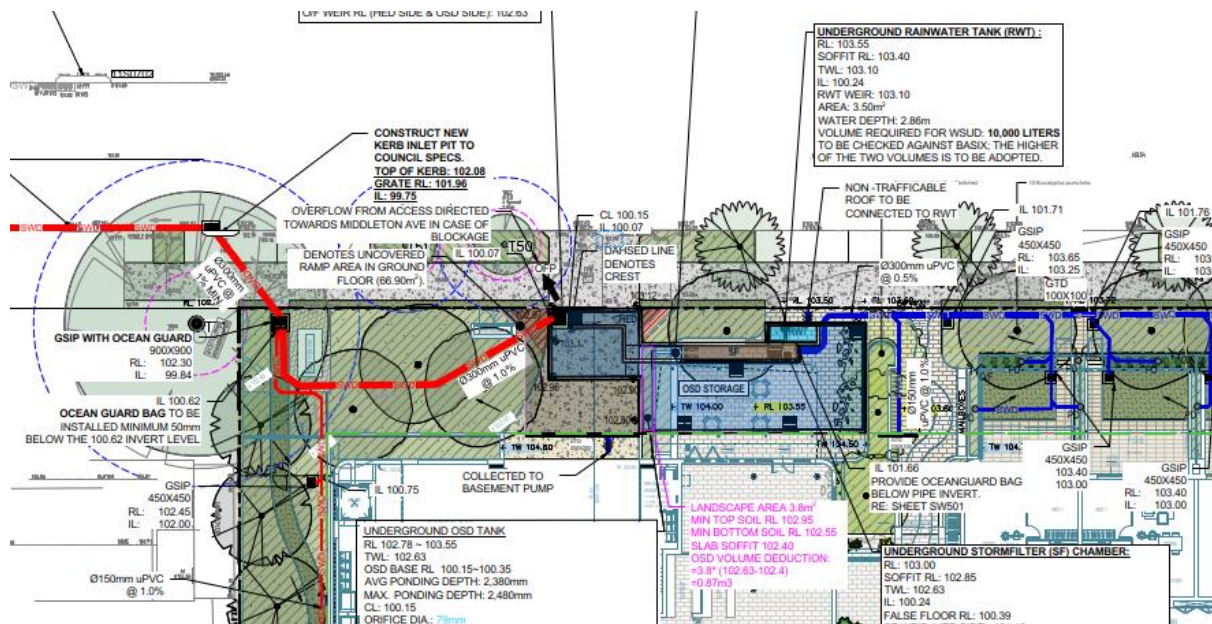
Proposed New Kerb Inlet Pit (Reference: S02-SW302)
